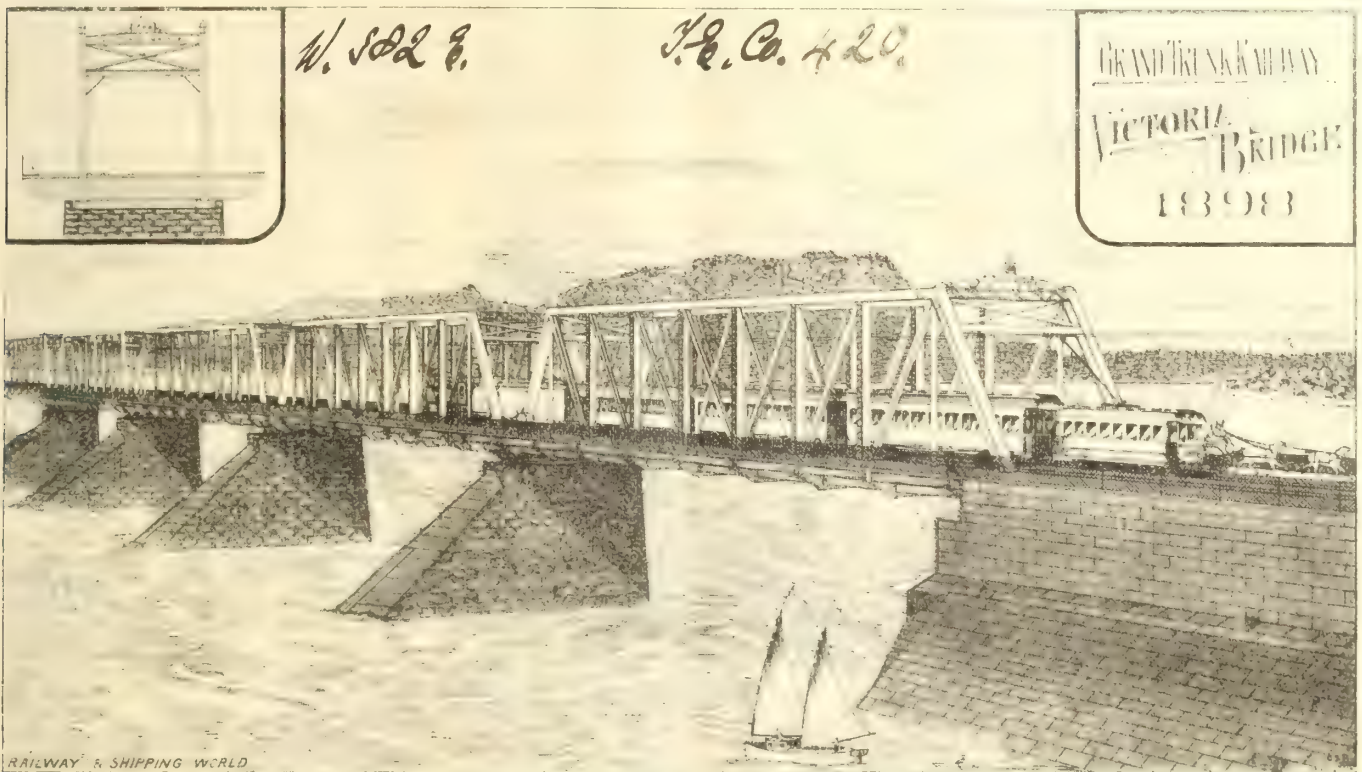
ABUTMENT AND END SPANS] VICTORIA JUBILEE BRIDGE.
